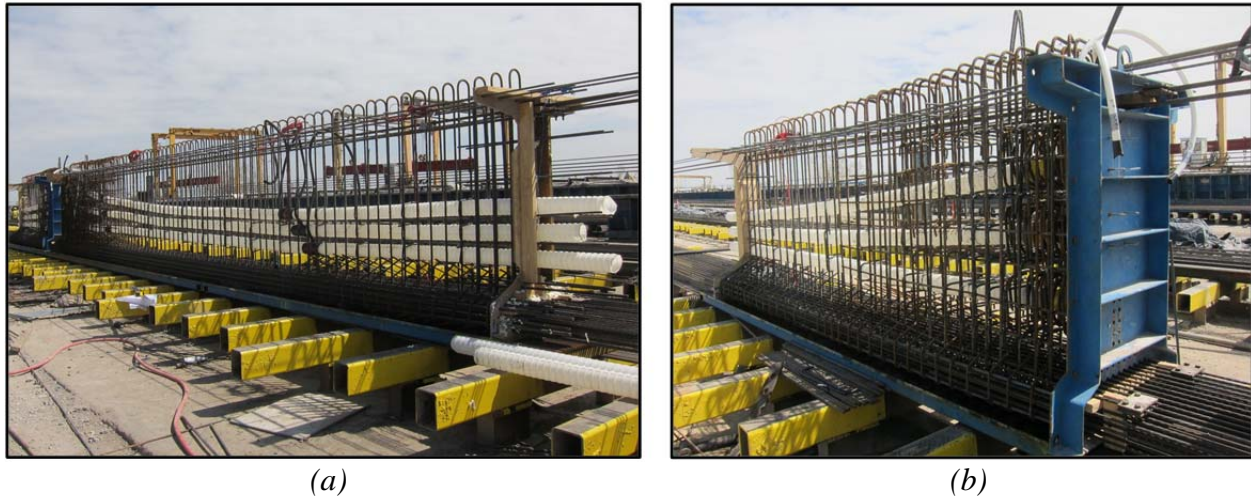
Completed reinforcing cages of precast girder segments – (a) long precast segment; (b) short precast segment
